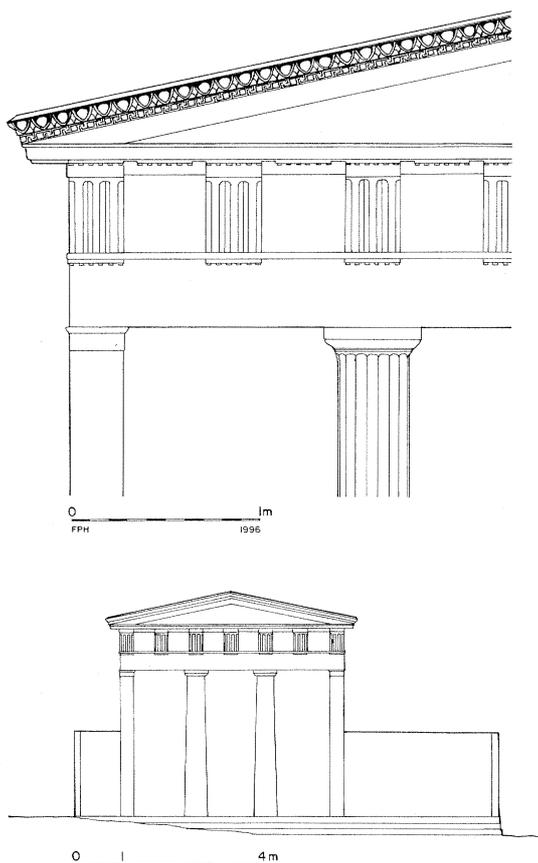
North Gateway, restored elevation on monument base M⁵, looking south
